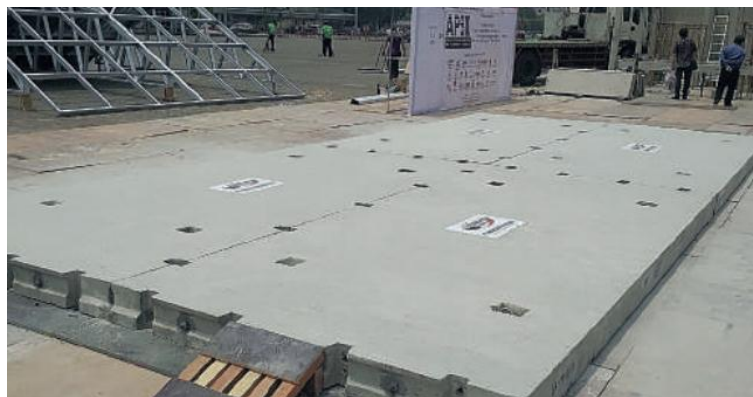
Precast Concrete SPRigWP (waskitaprecast.co.id)
